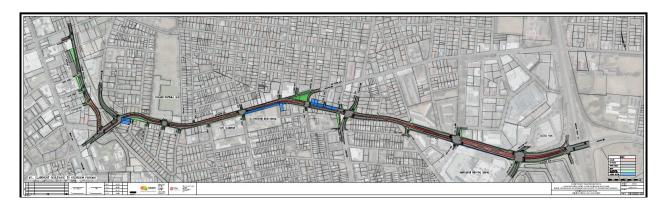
Long section W1-Chichester Road-M5 Kromboom Park Way to Claremont Boulevard/Hawthorne Road Intersection
